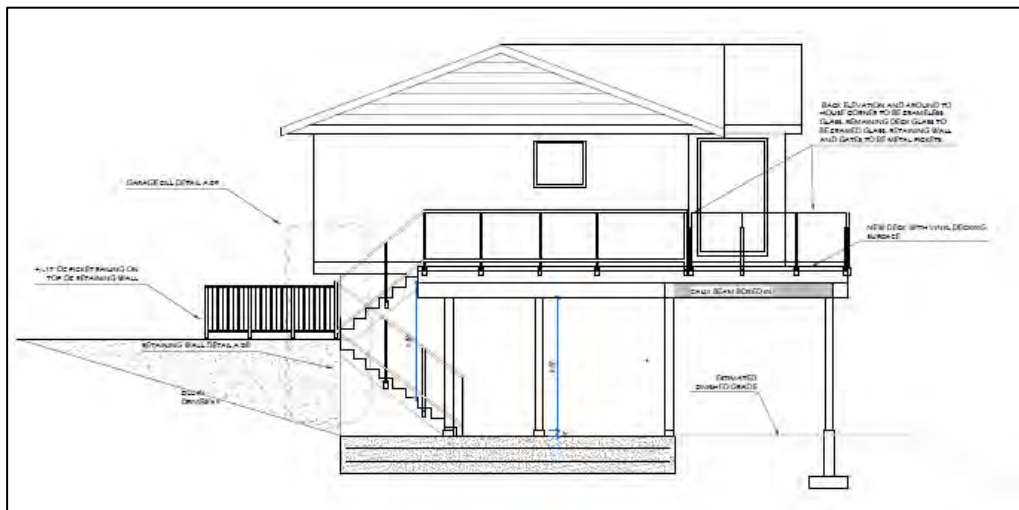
Side view of the building and proposed deck expansion. Drawings provided by Momentum Design Build.
